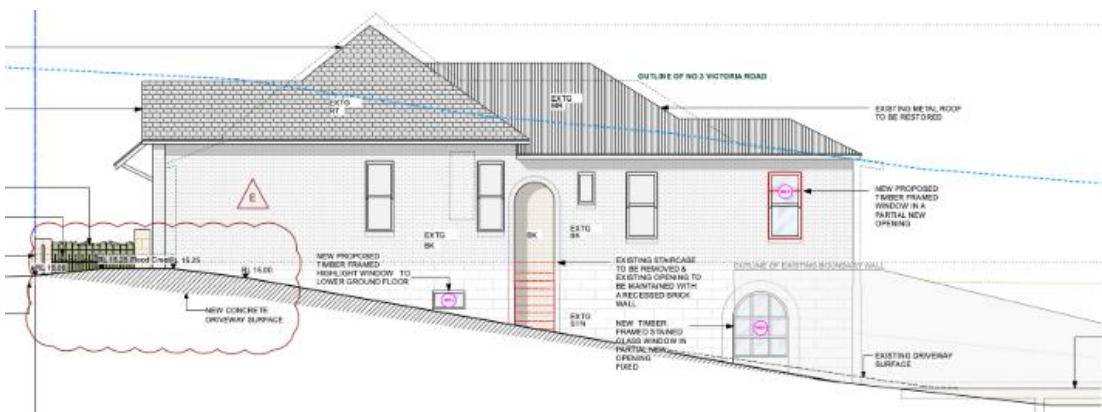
Proposed north-east (side) elevation – Dwelling 1 (ground floor) and Dwelling 3 (lower ground floor)
